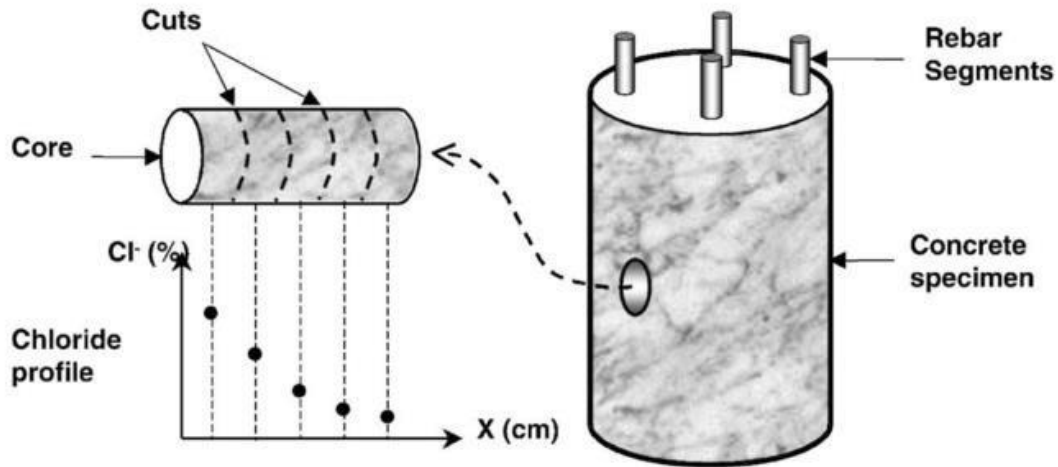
Reinforced concrete specimen geometry and chloride profile sample selection [47]
